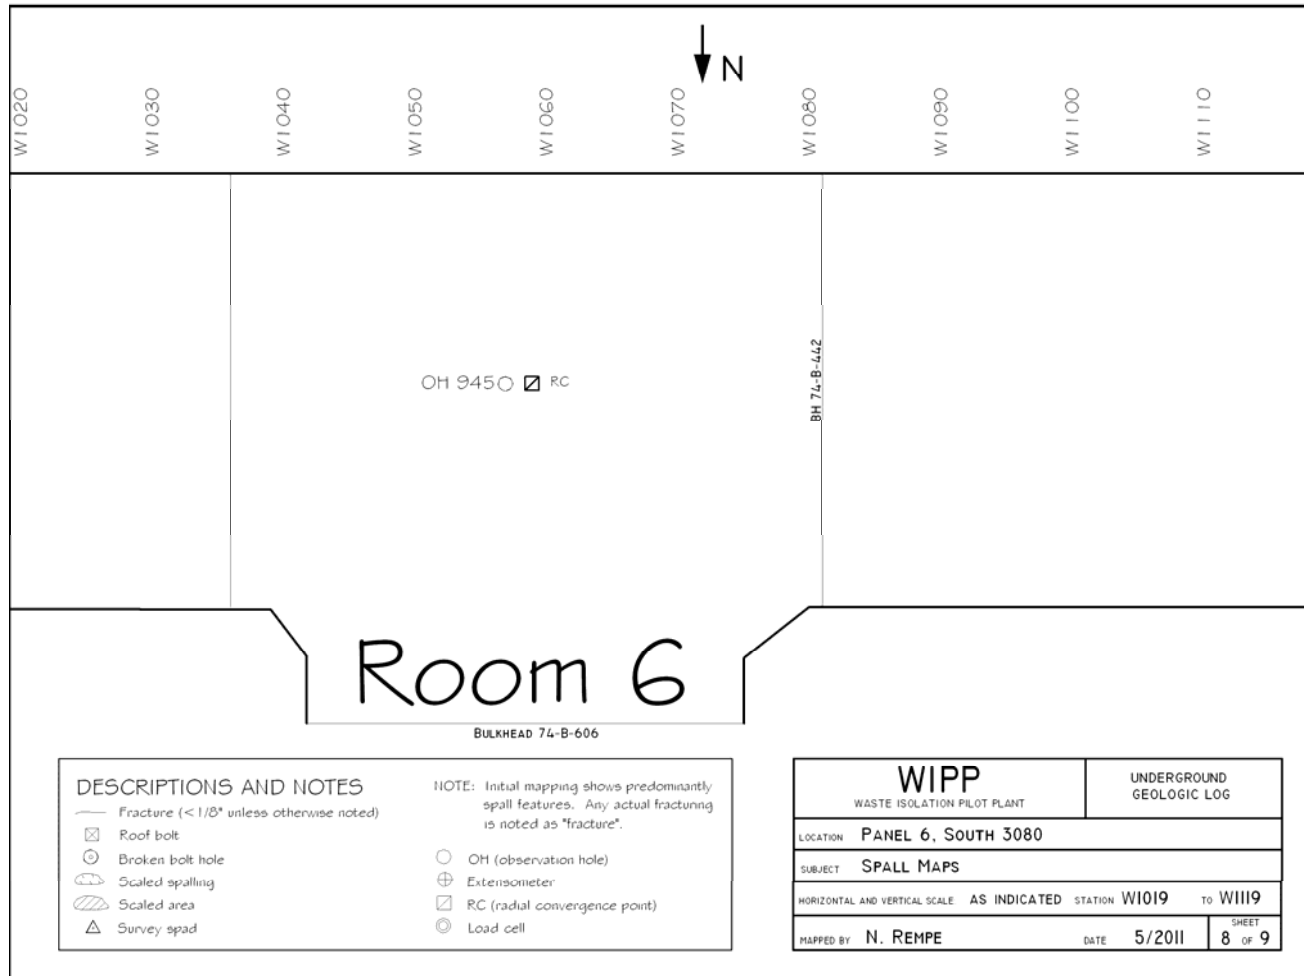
Panel 6 S3080, W390-W1210 Roof Fractures (Sheet 8 of 9)
